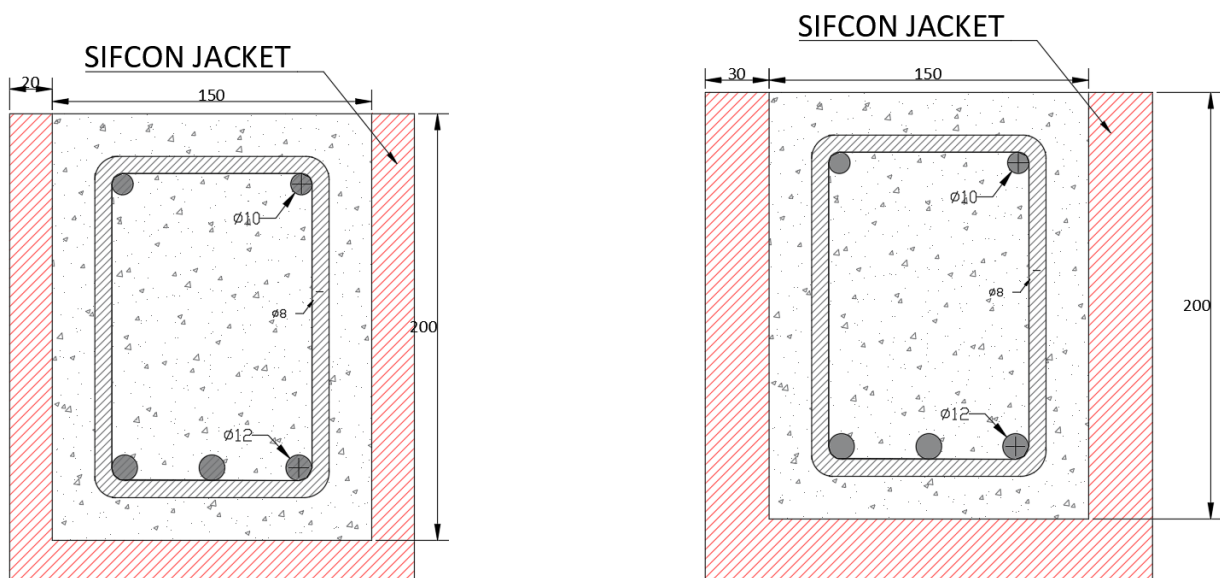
Process of strengthening the fire damaged LWC beam specimens
